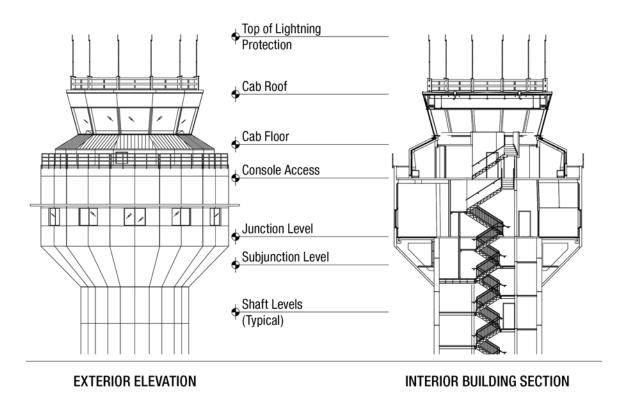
Airport Traffic Control Tower – Typical Floor Levels
